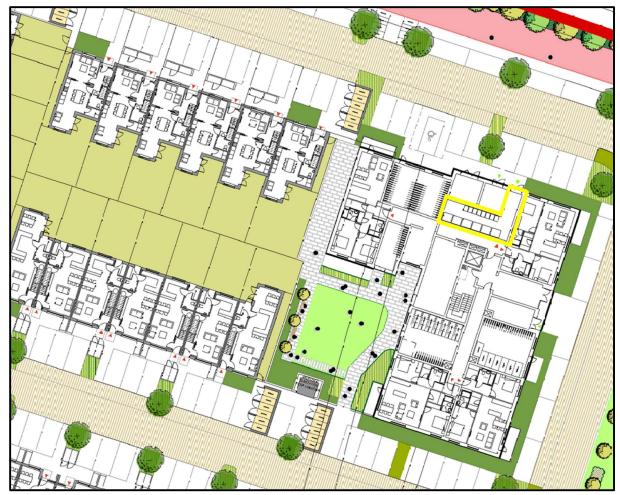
Location and internal layout of Waste Storage Area in Block D (Yellow) (O'Mahony Pike, 2025)
